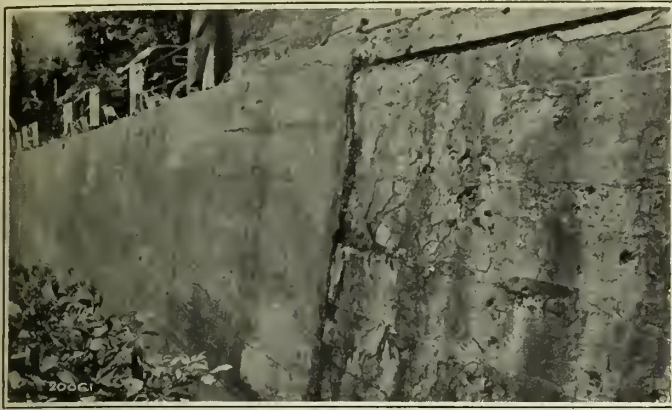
Failure of the Concrete in a Retaining Wall.
